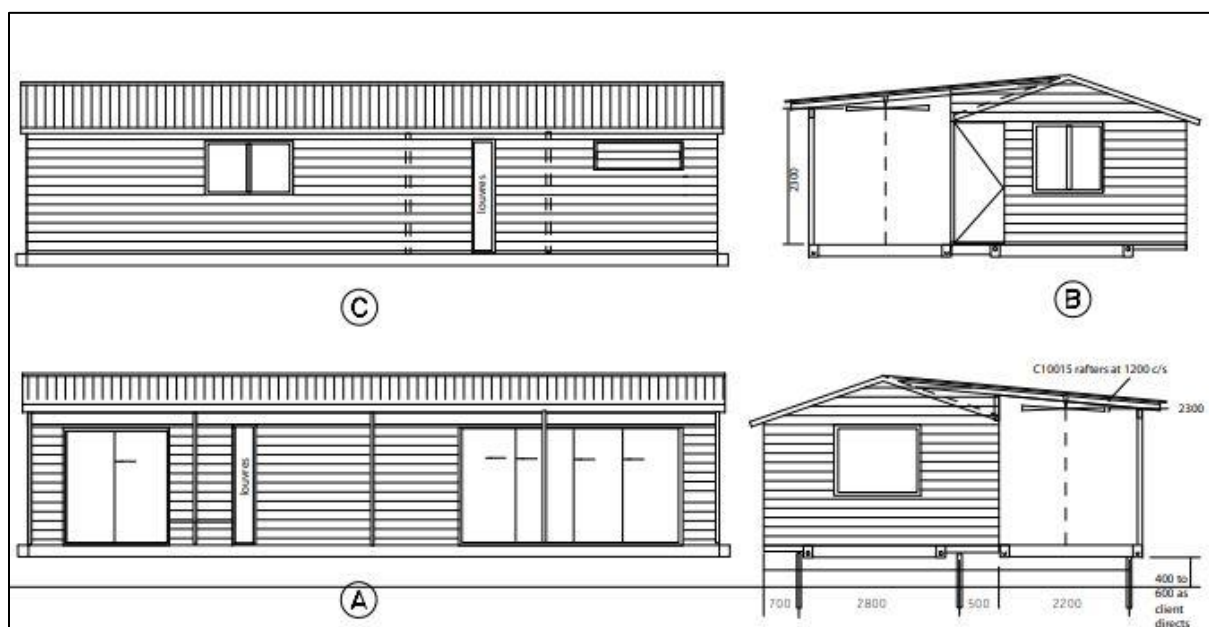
Proposed Secondary Dwelling. (Kwik Built)
